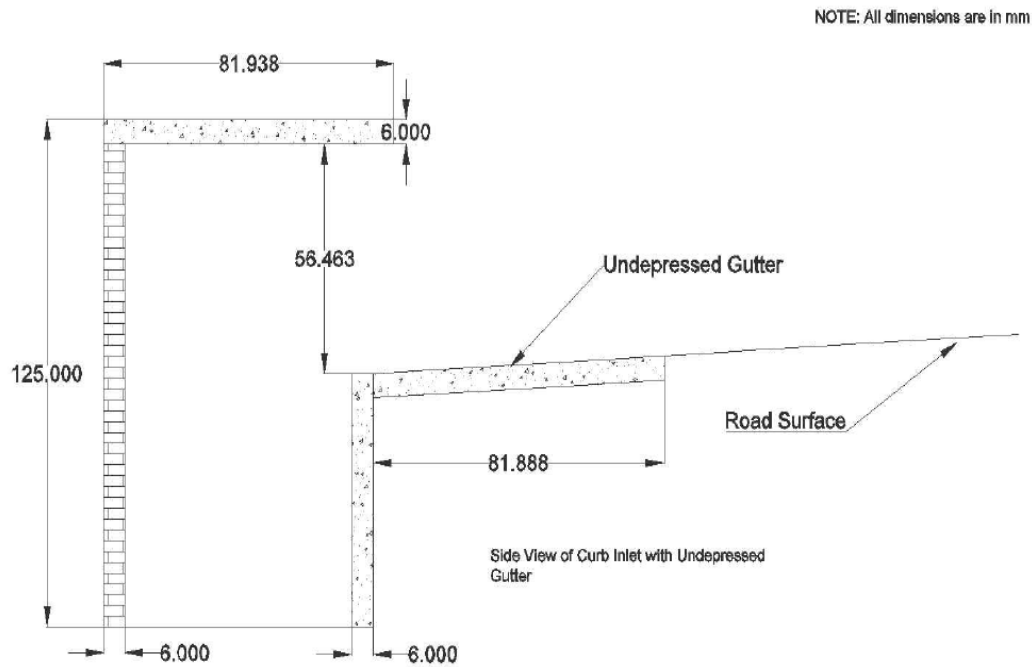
Side view of a curb inlet with an undepressed gutter
